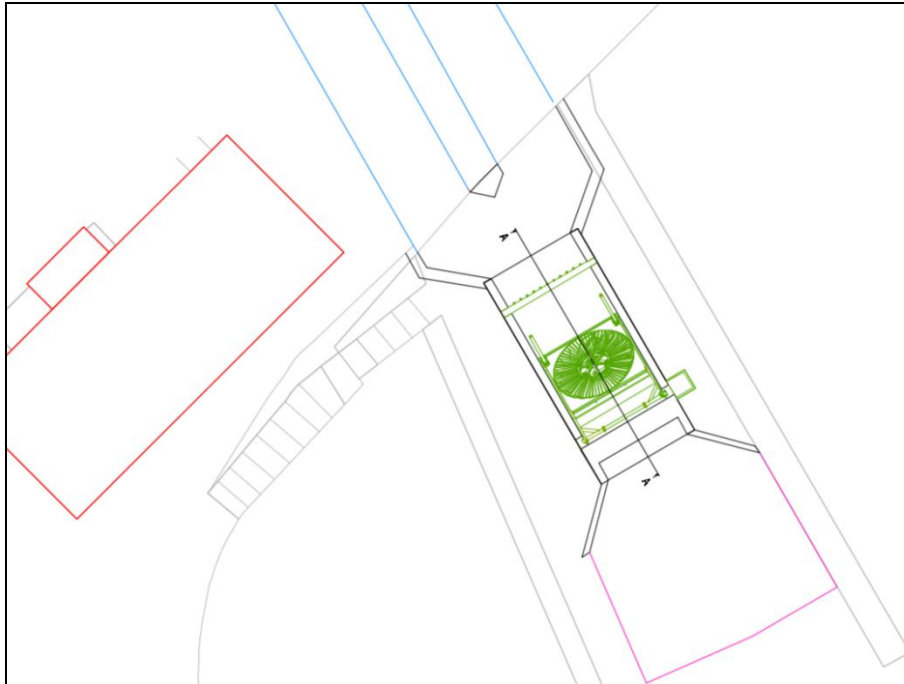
Proposed Turbine layout (tail race excavation is shown in magenta)
